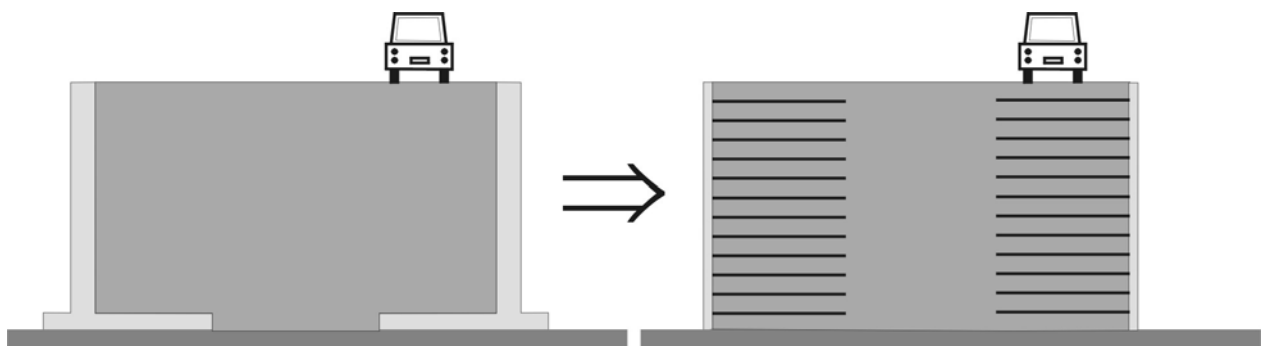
Example of supporting structure from reinforced soil instead of classical concrete wall.
